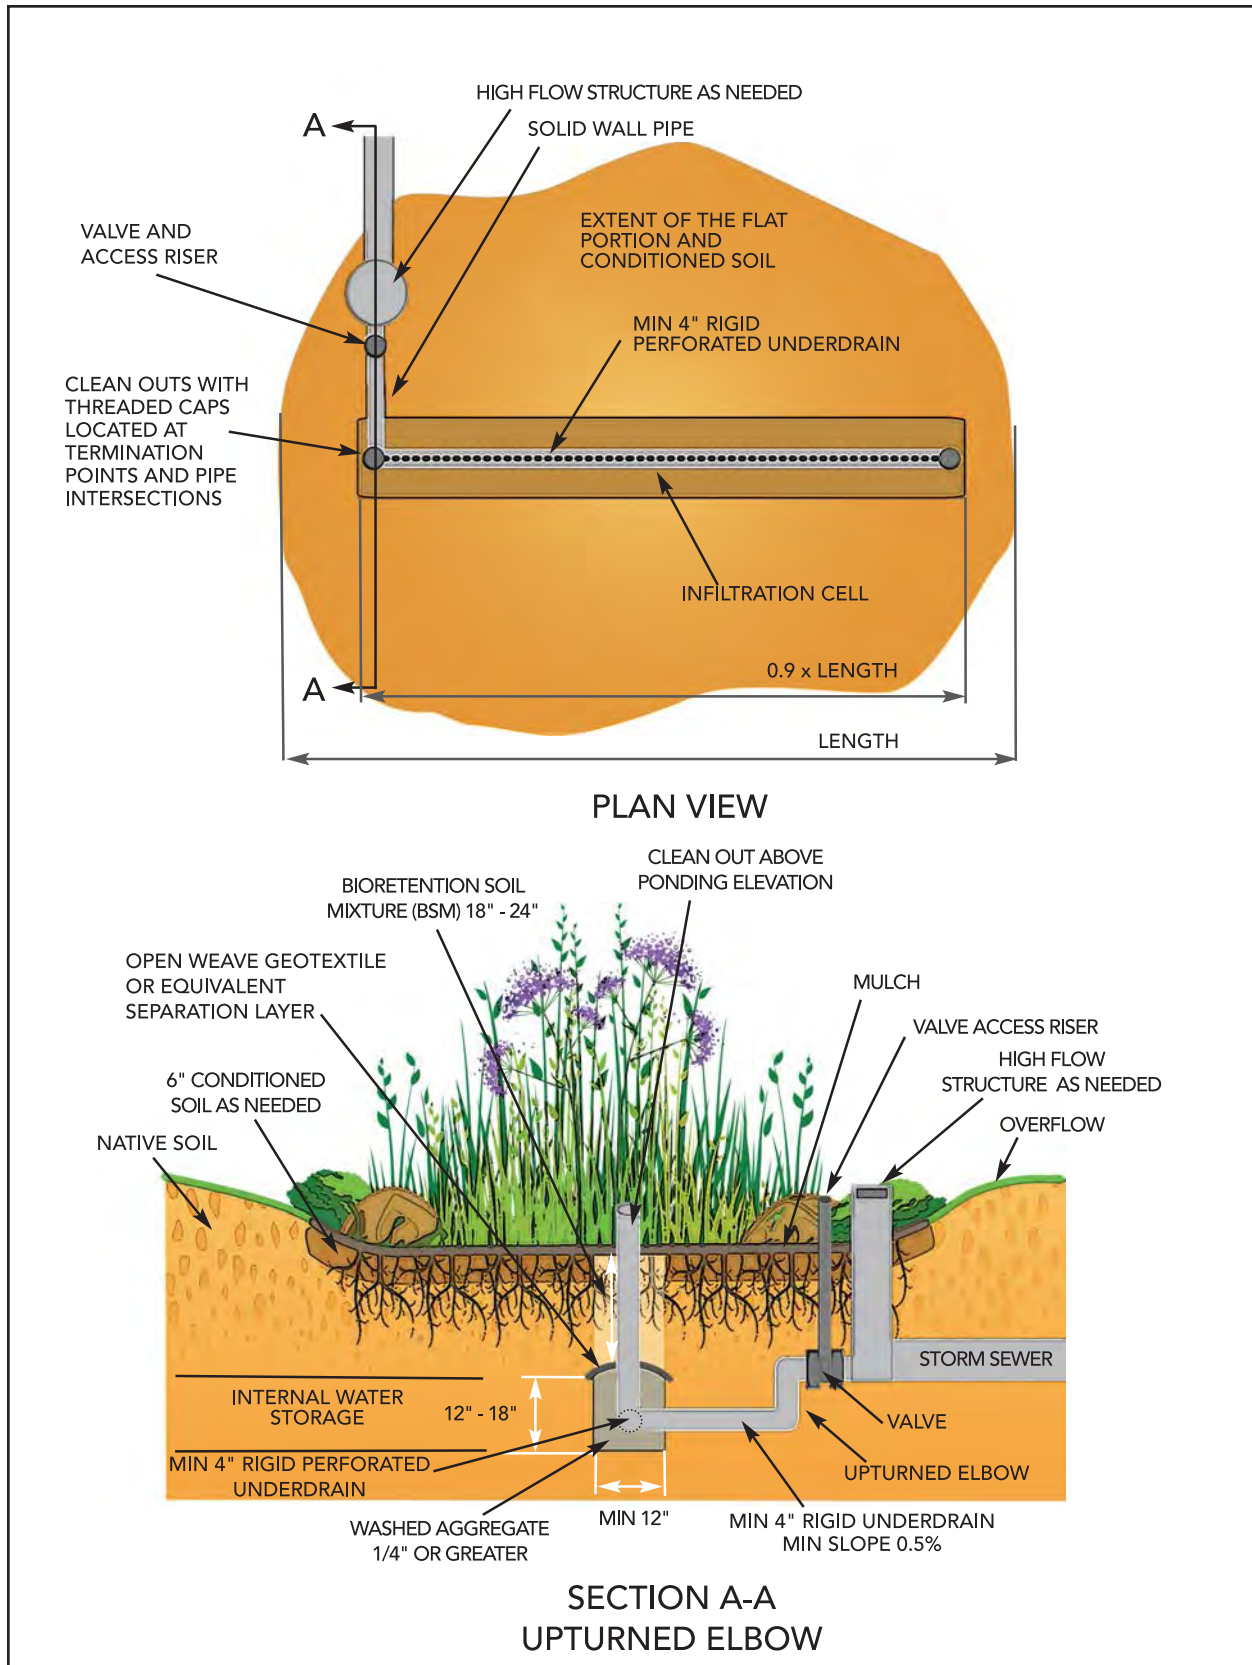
Cross Section Schematic of Bioretention System with Uprturned Elbow Outlet Control
